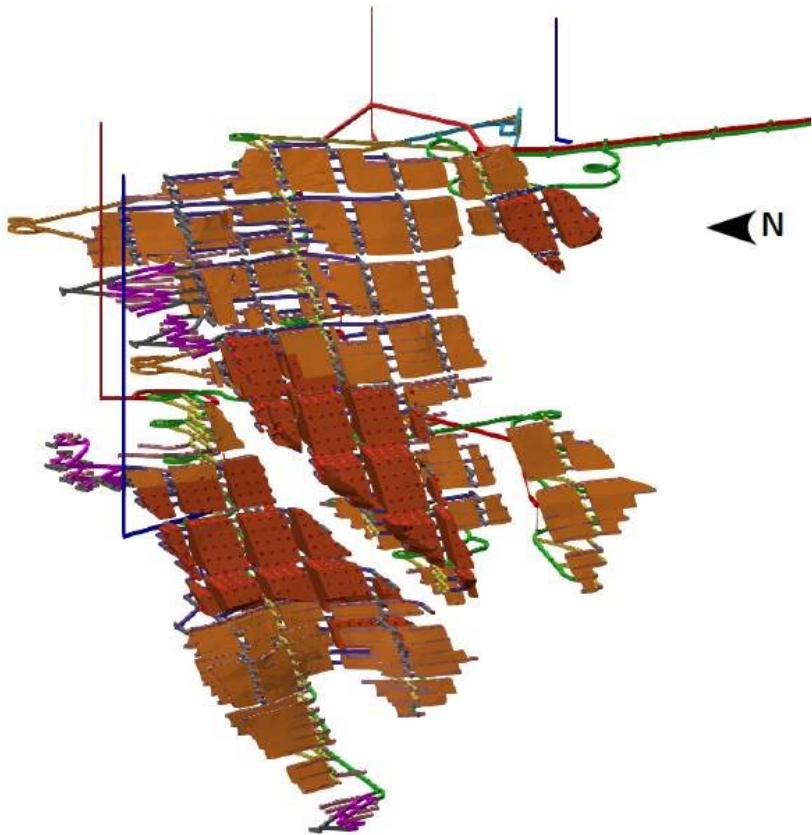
Isometric image of F-North Mine Design (not to scale)
